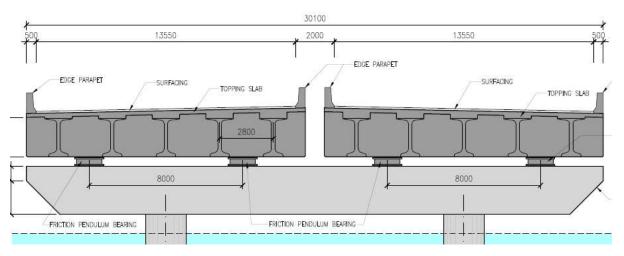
Typical Section of Lake Viaduct with AASHTO/NU Girder
